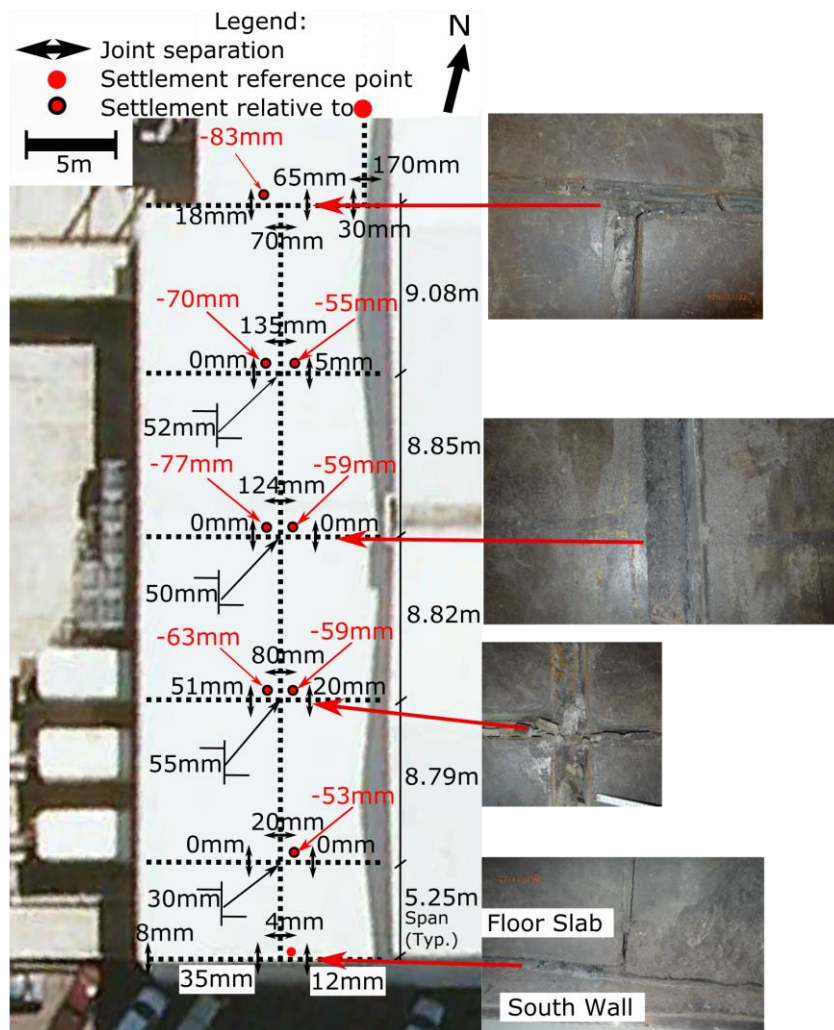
Southern part of Shed floor slab construction joint separation measurements. Photographs along right side of figure are of construction joints at which measurements were taken and are aligned vertically with each depicted joint. (Surveyed 22NOV16).
